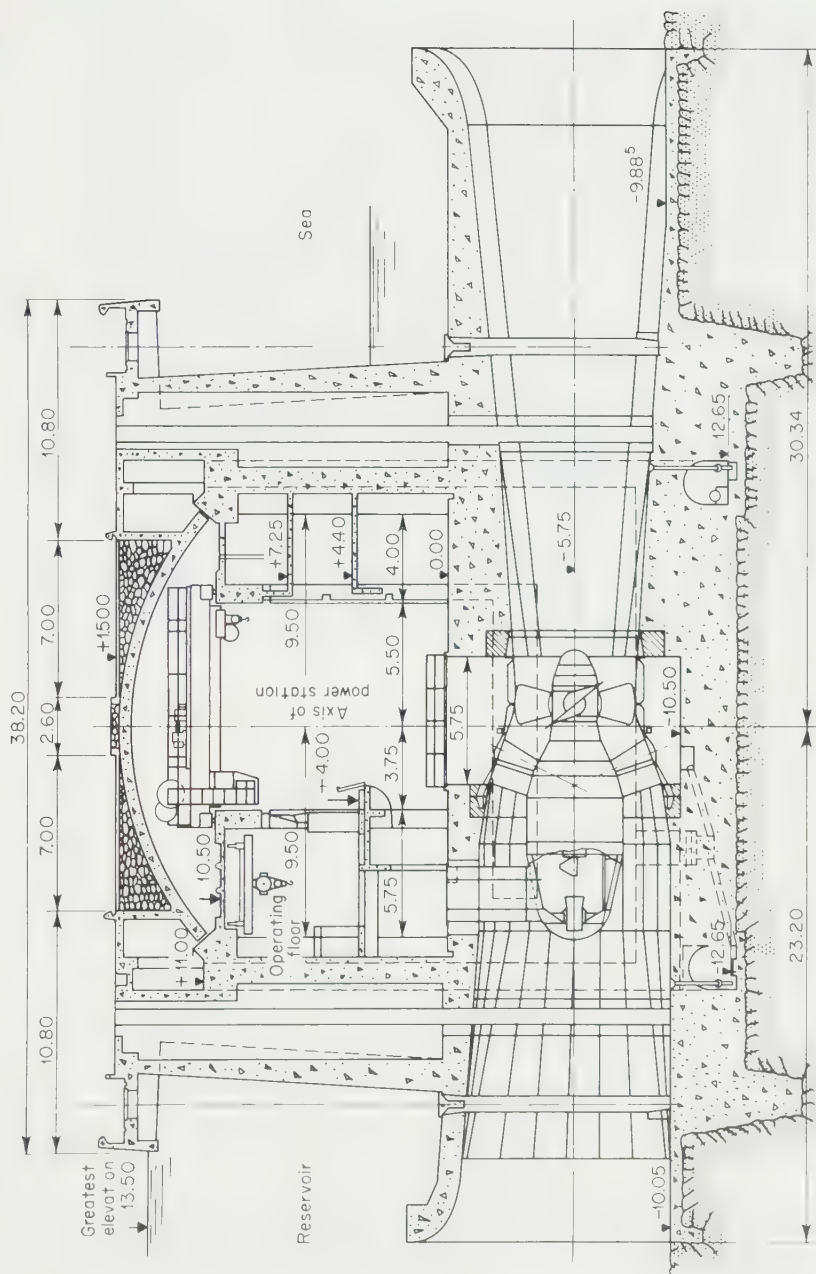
Section through the Rance power station on a machine centerline (dimensions in meters).
